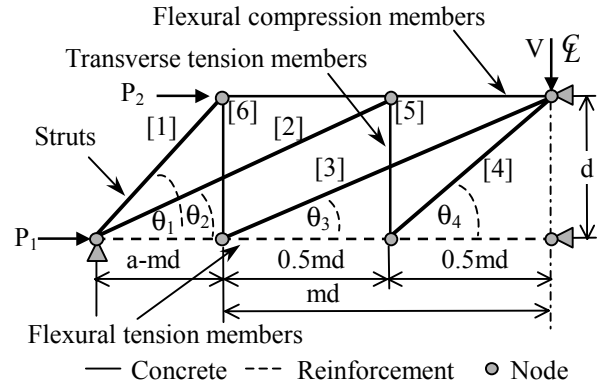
Simplified truss model for a PC beam without transverse reinforcement
